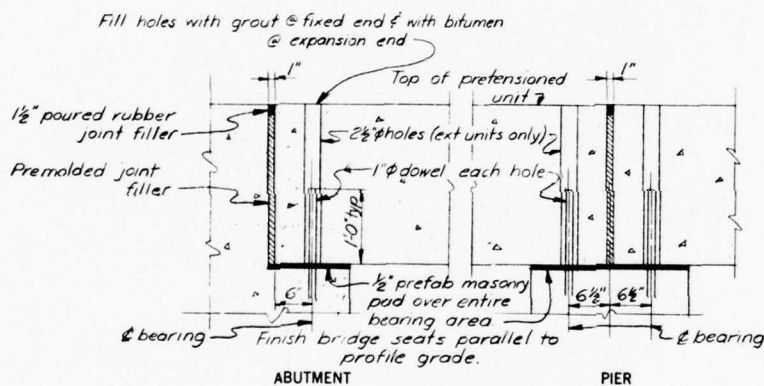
Details of standard precast prestressed concrete voided slab bridges
